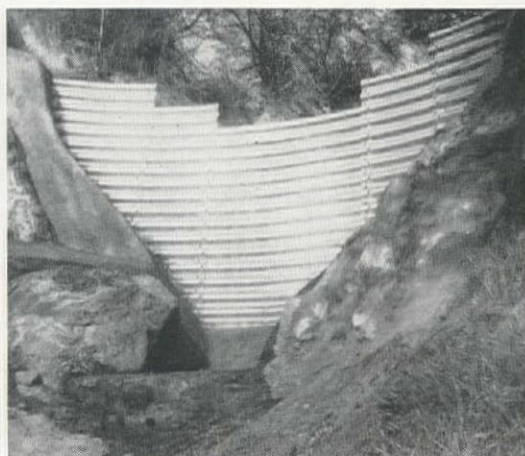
Multiplate arch with rammed soil-cement abutments and stilling basin.
